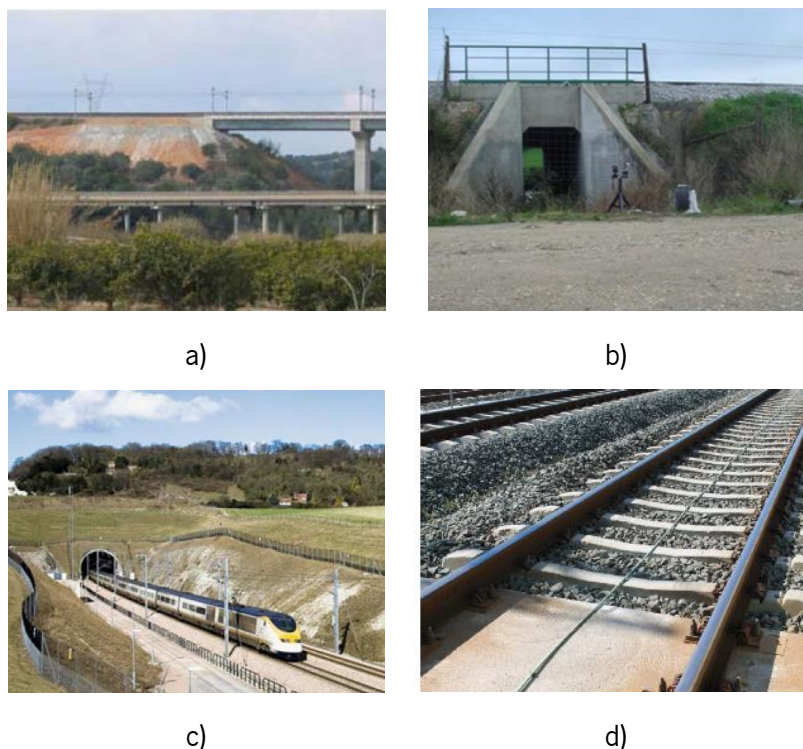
Examples of transition zones (Alves Ribeiro, 2012): a) transition between an embankment and a bridge; b) inferior crossing to the track; c) transition between an excavation and a tunnel; d) transition between a ballasted and ballastless tracks on the high-speed line Cordoba- Malaga (Spain) (Sañudo et al., 2016a)
